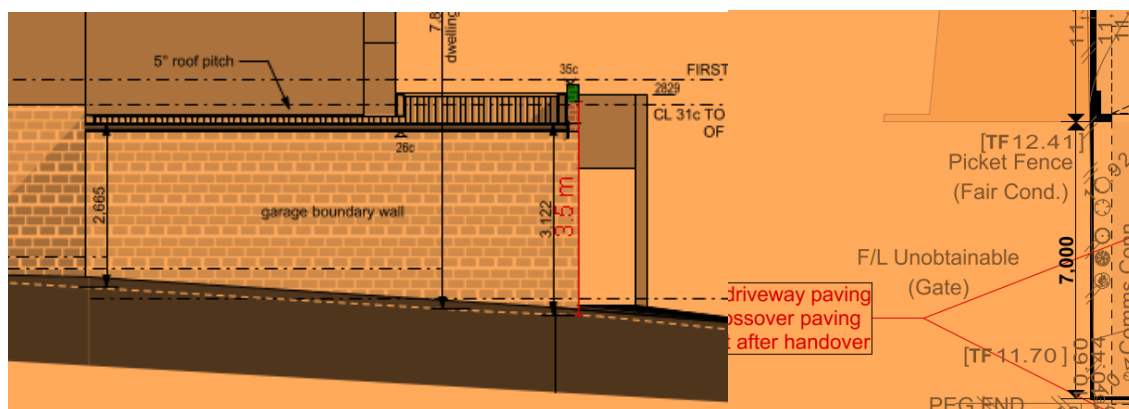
Area of overheight boundary wall highlighted and extract from shade diagram.
